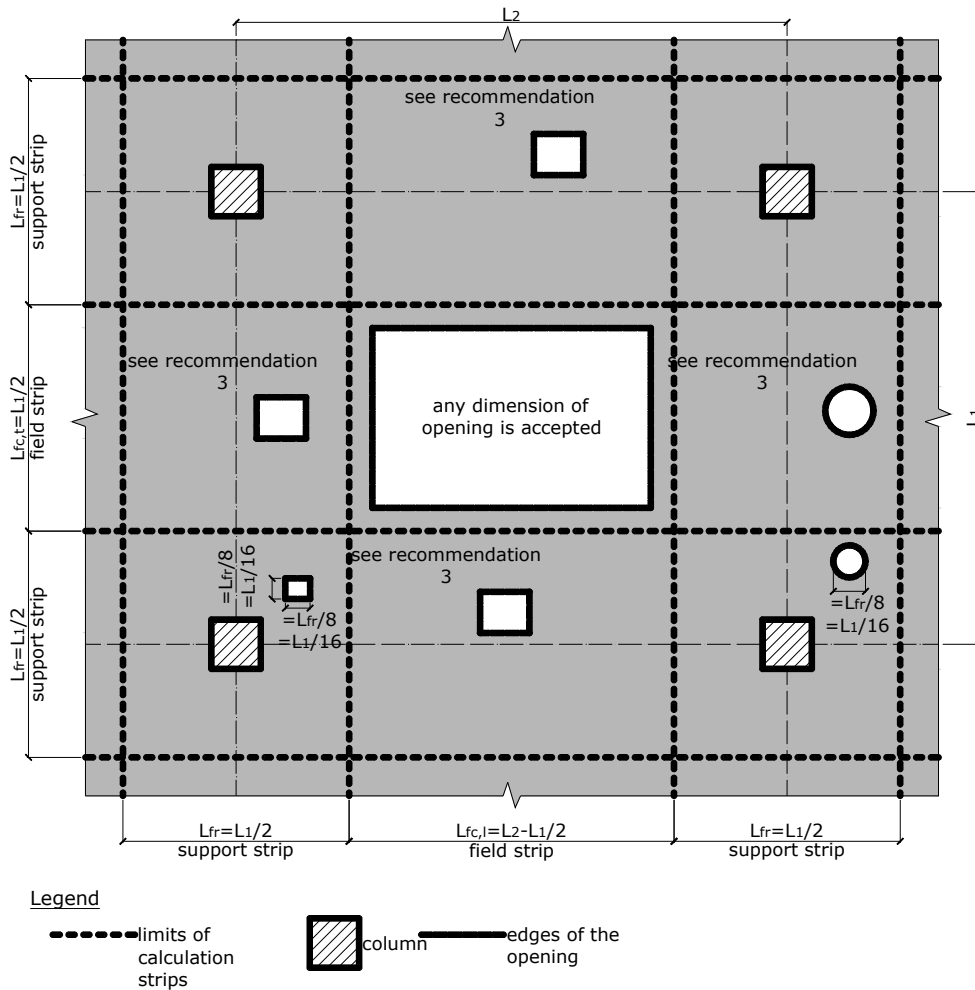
ACI 318 recommendations on the position and sizes of openings for beamless slabs.
